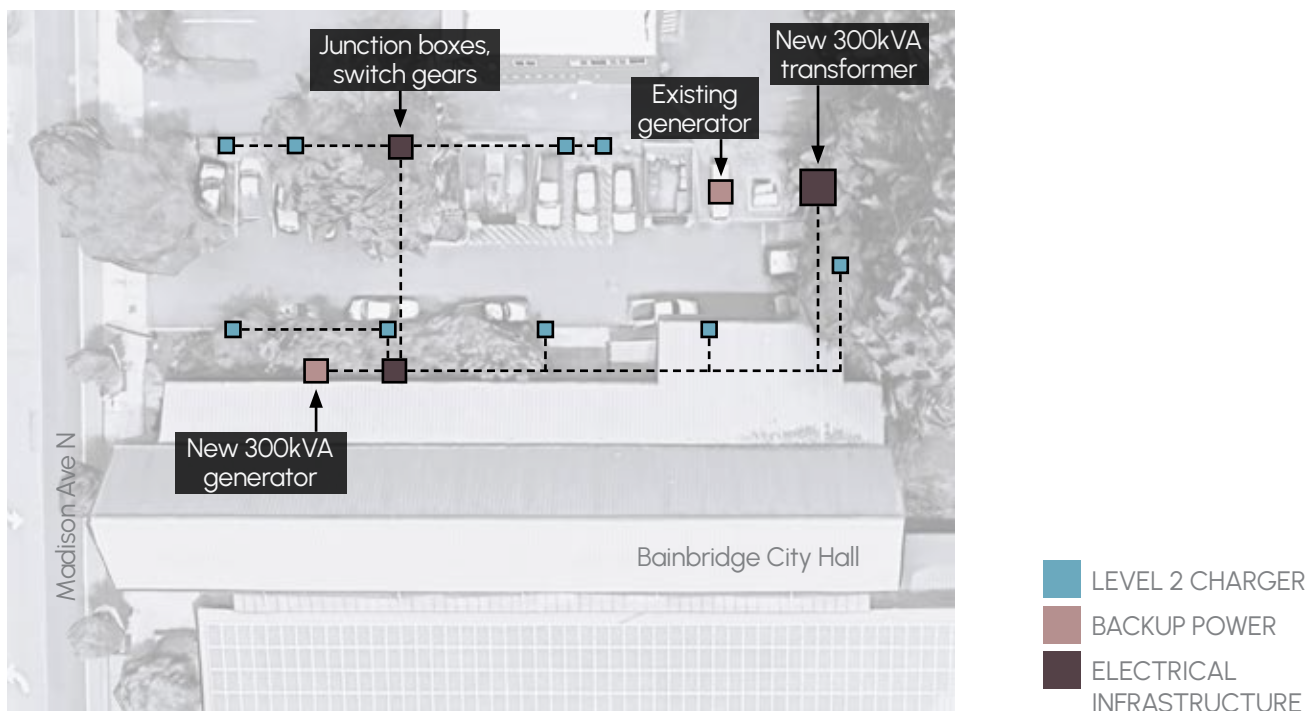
Proposed City Hall electrical equipment and infrastructure layout
